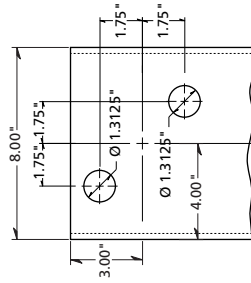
DETAIL POST ASSEMBLY 6 x 4 SIDE ELEVATION Q1
